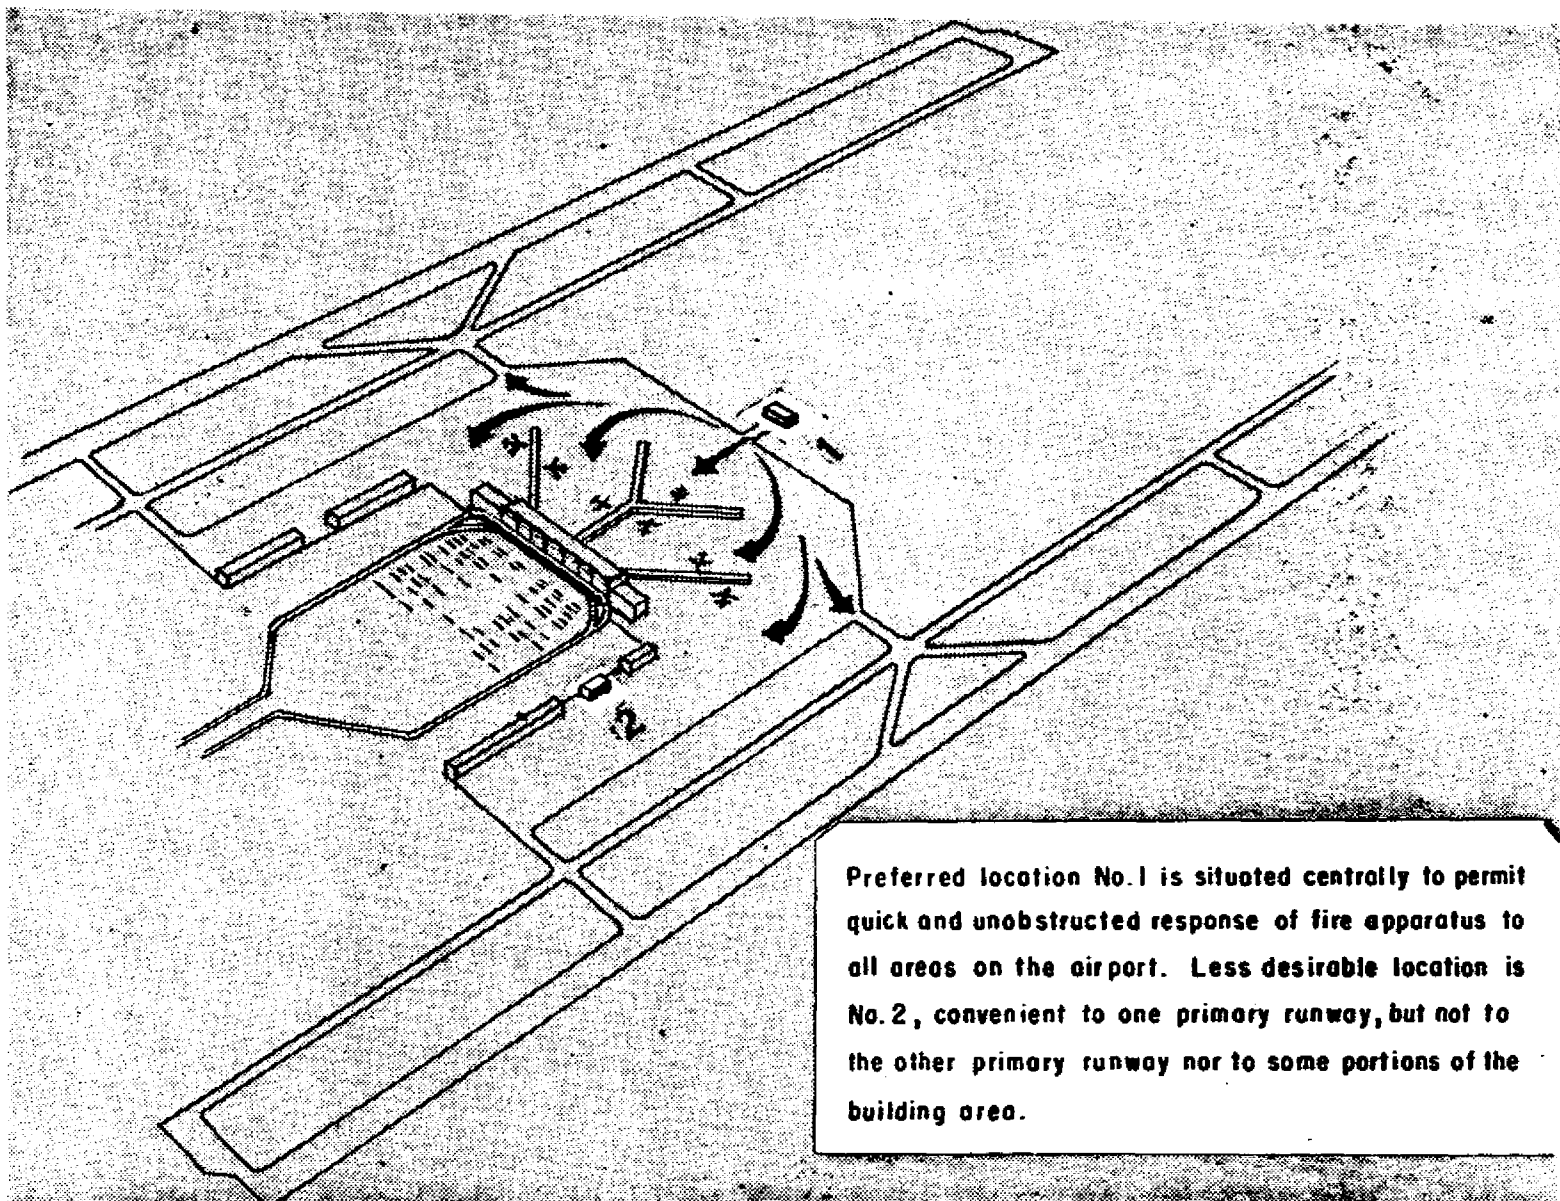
TYPICAL FIRE BUILDING SITE LOCATION
